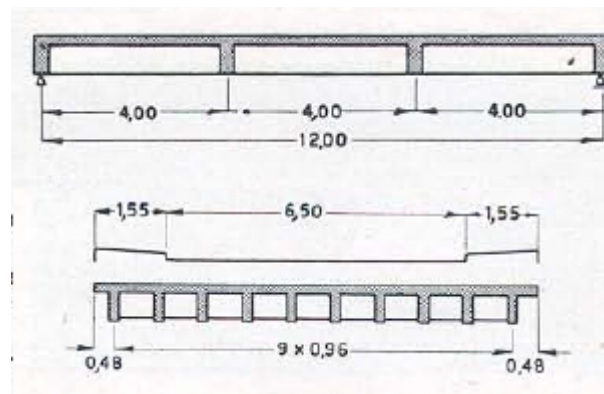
A side view and front view of a concrete bridge with longitudinal and transverse rib stiffeners
